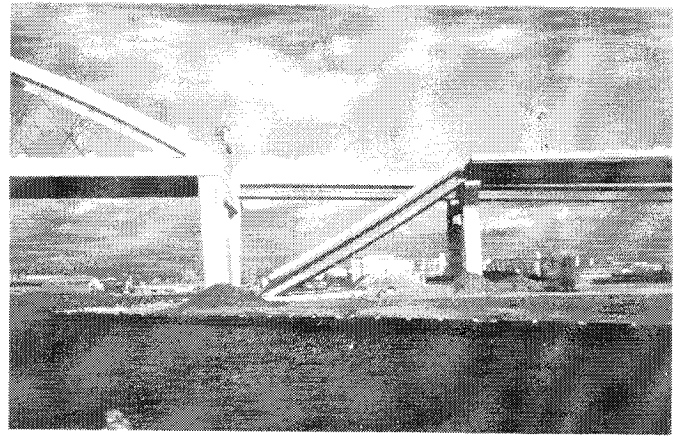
Collapse of the deck of Nishinomiya bridge during the Kobe earthquake
